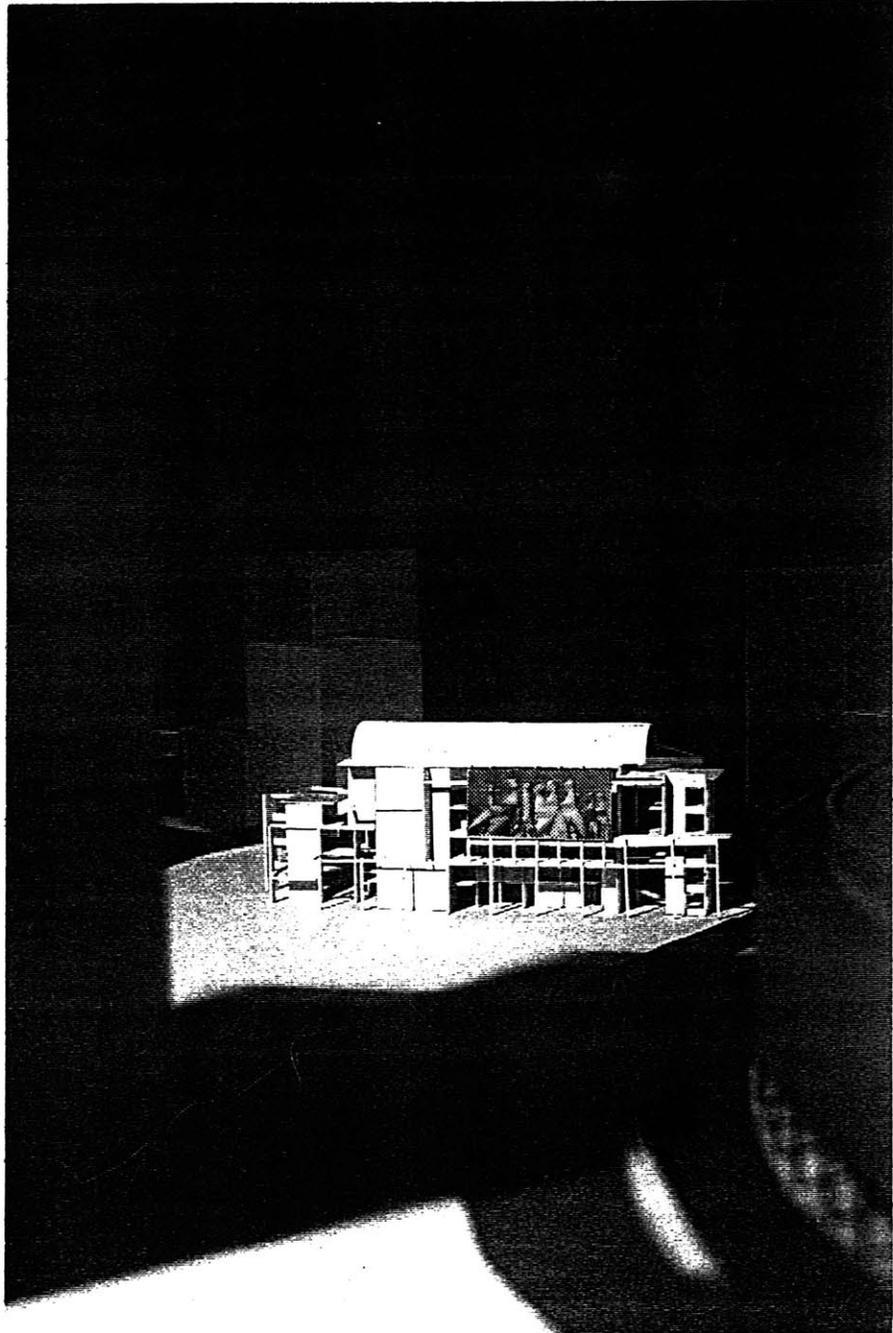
Model, plaza elevation, view south from Congress Street next to the JFK building.
